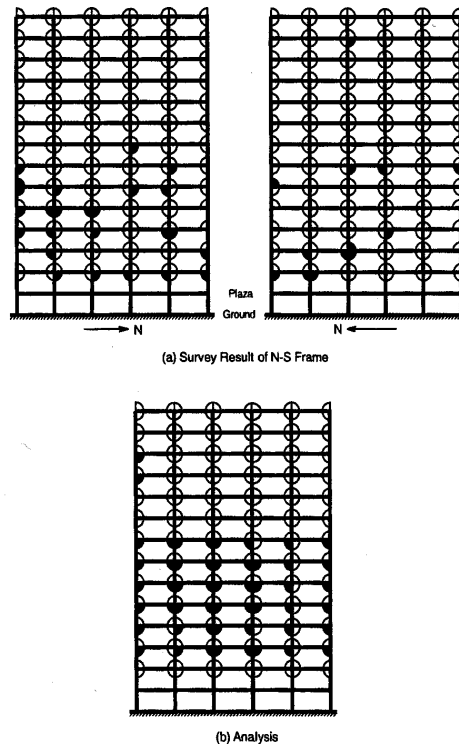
(a) Surveyed and (b) Predicted Damage for N-S Frames in Building B
